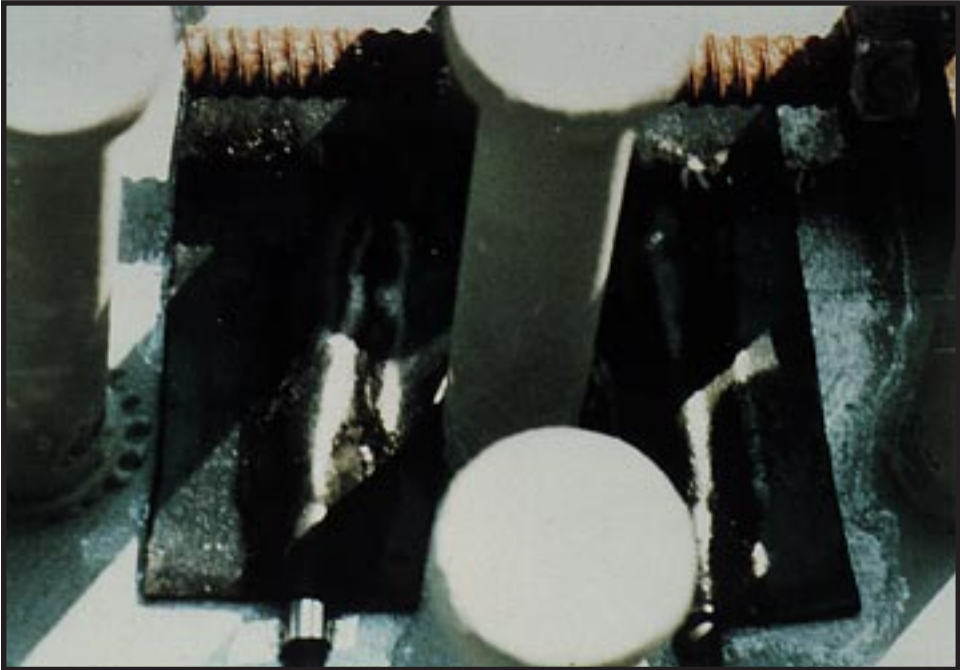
Electrical resistance strain gage on reinforcement. The gage is attached to a short length of steel reinforcement and located in the web of a prestressed concrete girder.
